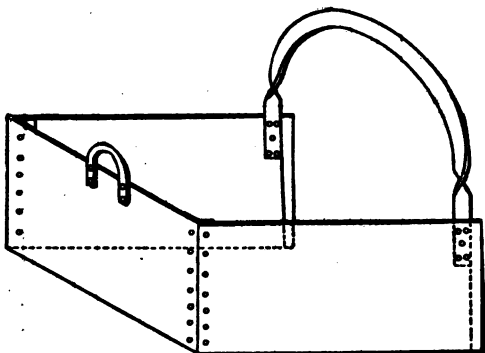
Sketch Showing Steel Plate Shield Employed in Laying Sewer Pipe.
